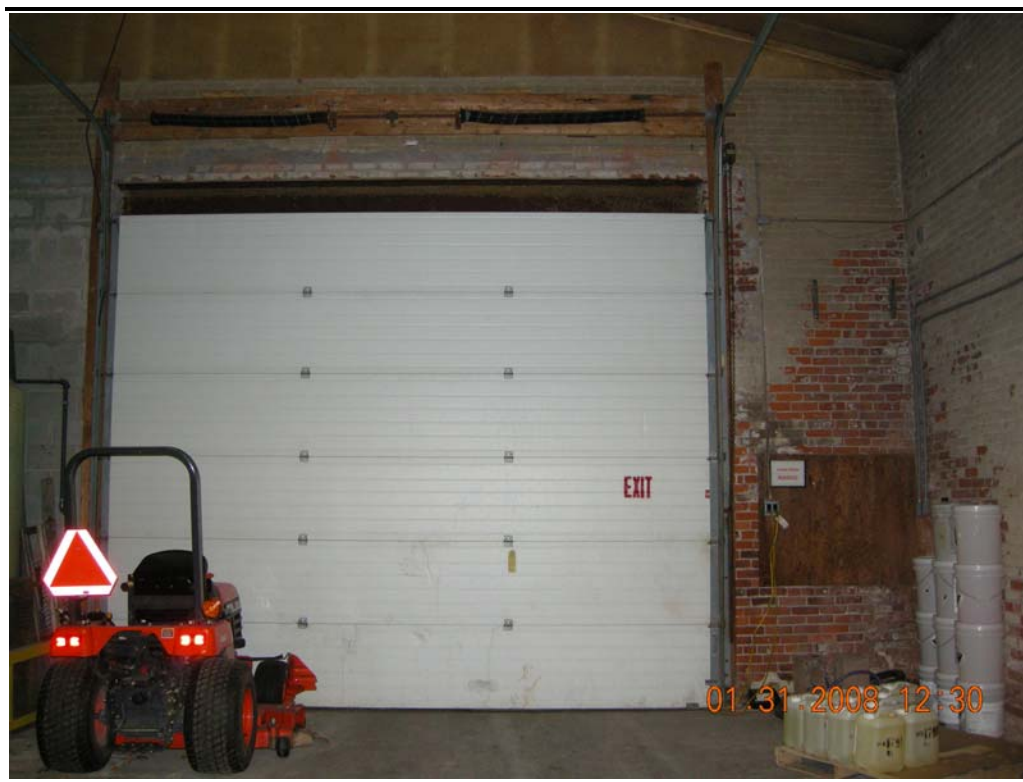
Lawn equipment storage in compressor room near overhead door.
